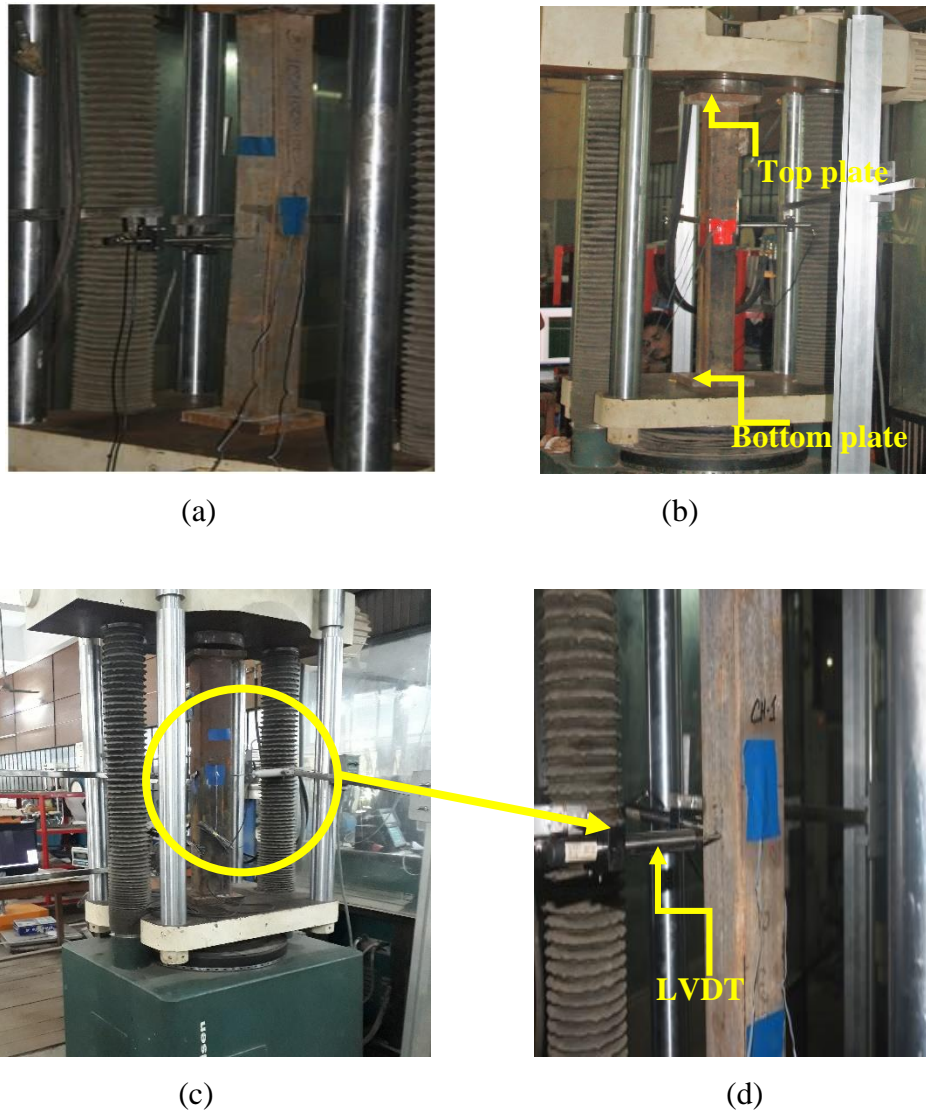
(a) Setup of concentrically loaded column (b) Location of top and bottom plate (c) and (d) Location of LVDT
